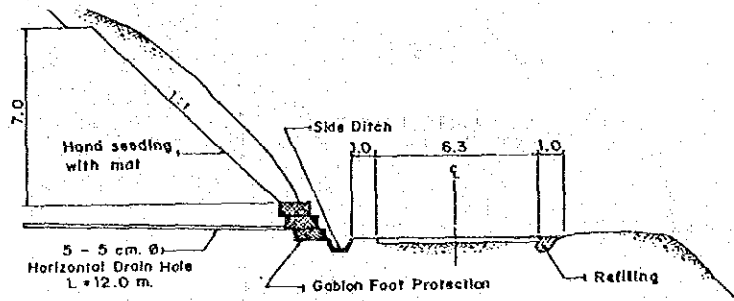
HORIZONTAL DRAIN HOLE
